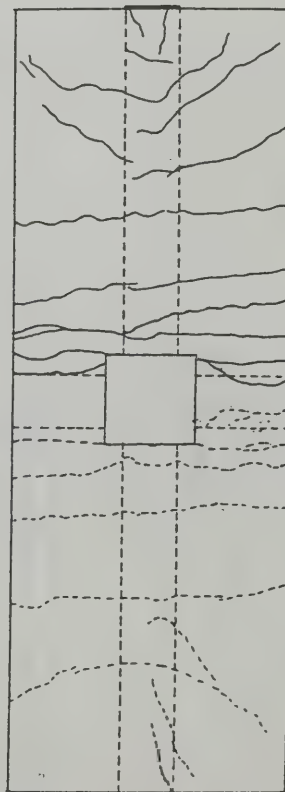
(Continued): Crack Pattern (Specimen I-1)      Fig.5.2. : Crack Pattern (Specimen I-2)
